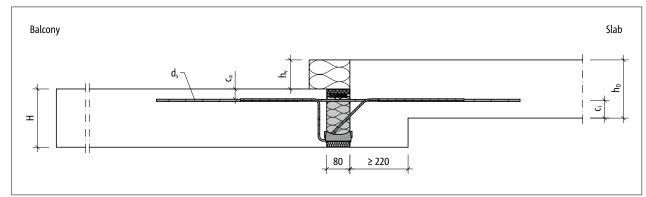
Schöck Isokorb® T type K: Smaller height offset downwards (balcony lying lower)
